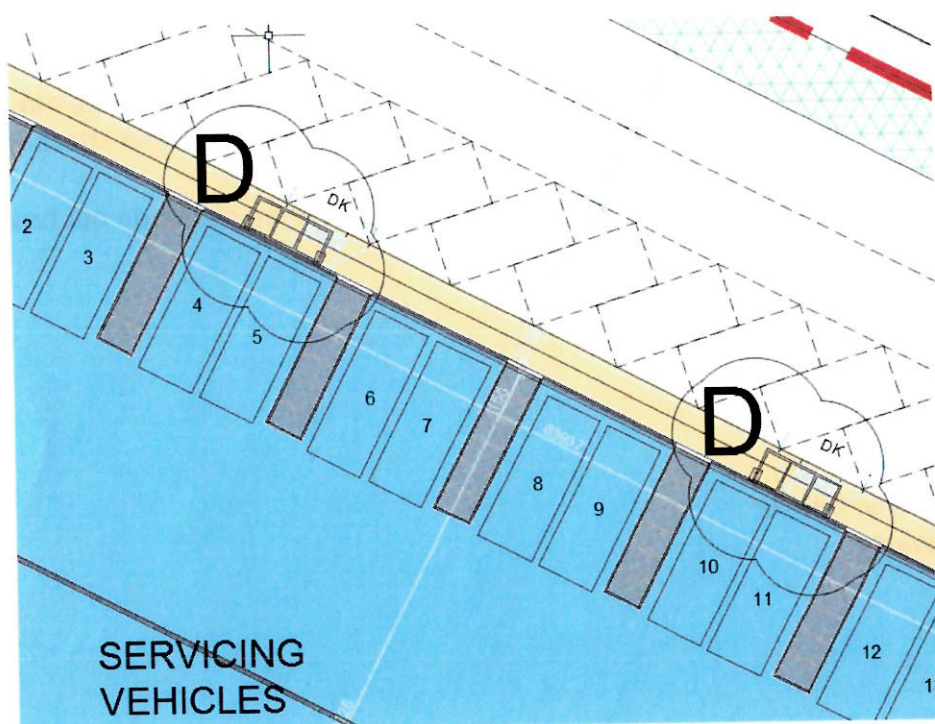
All-Weather Cantilever Shelters - proposed locations (Feature D)
